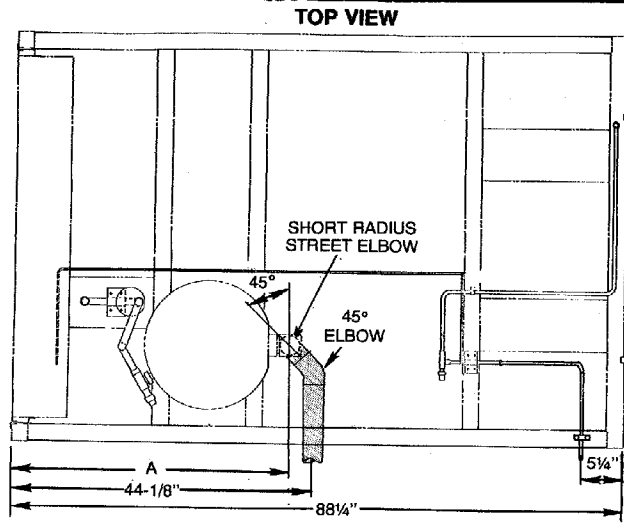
Piping Installation: 20 Through 30-Ton Units Without Isolators
